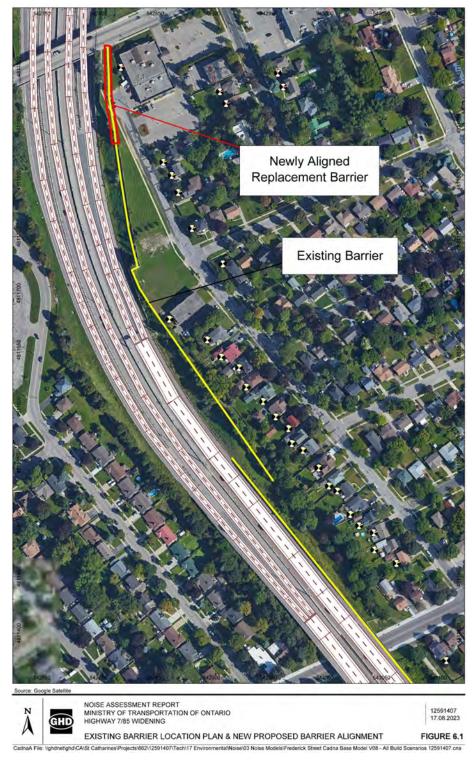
Existing Barrier Location Plan and New Proposed Barrier Alignment
